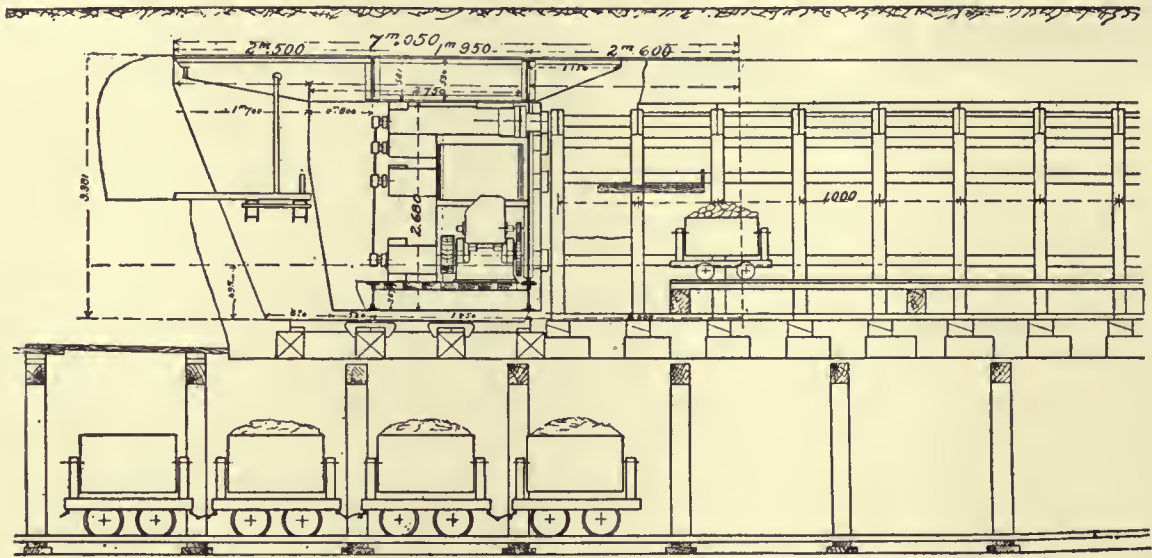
Paris Métropolitain Tunnel, longitudinal vertical section.
